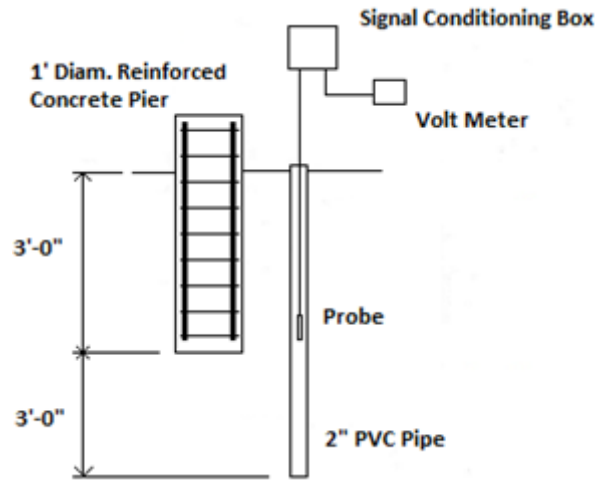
Schematics of the Reinforced Concrete Pier and the IF Test
